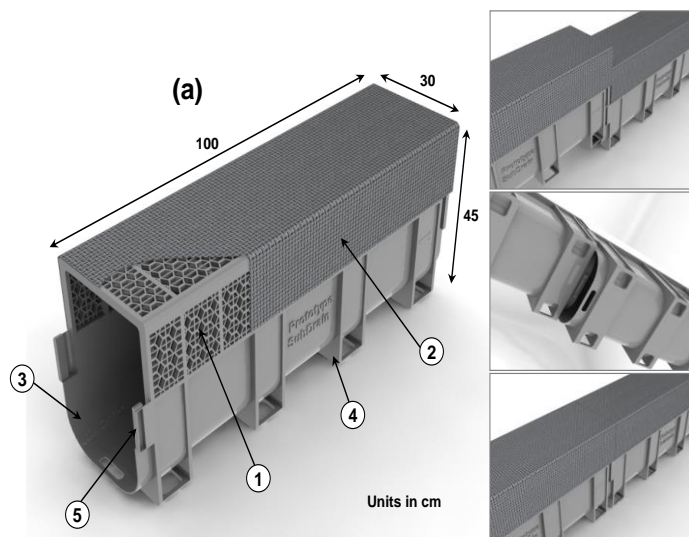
New Prefabricated Prototype for Subsurface Drainage of Road Pavements: (1) Deck with Hexagonal Cells, (2) Adhered Geotextile Filter, (3) U-shaped Channel, (4) Structural Ribs, and (5) Male-female Joints.
